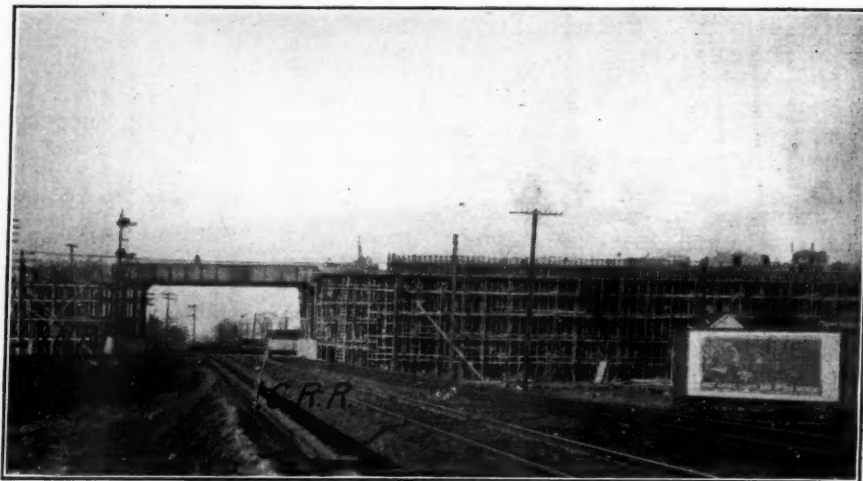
FORMS ERRECTED FOR AULON VIADUCT. LONG STEEL SPAN IN PLACE.
